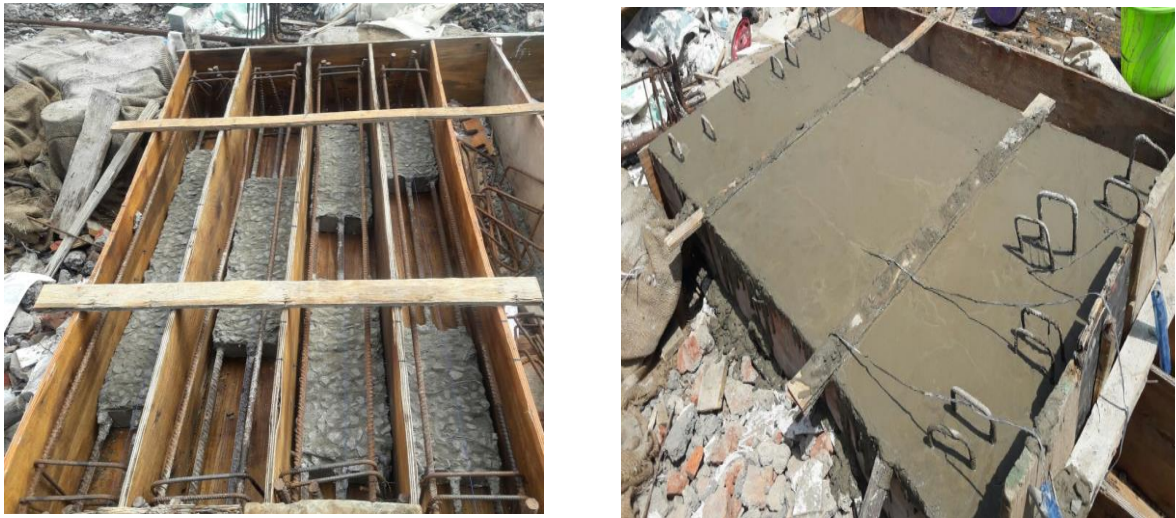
Placement of the damaged bond section and casting of the second set of beams
